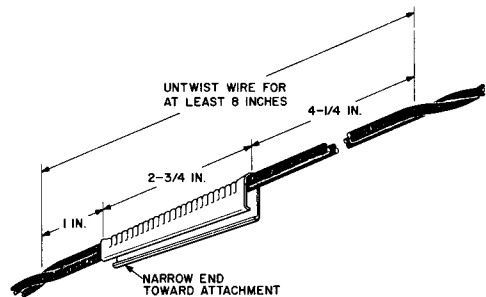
Installing Drop Wire Clamp on Twisted Pair Wire
